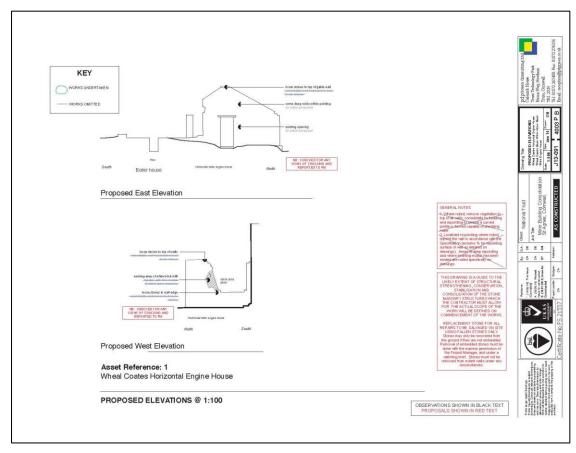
Eastern external elevations of Wheal Coates horizontal engine house and boiler house and western external elevation of horizontal engine house.
